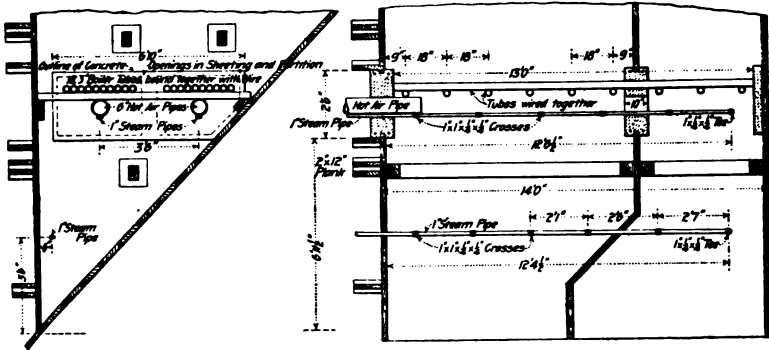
Arrangement for Heating Sand and Stone in Bins.
